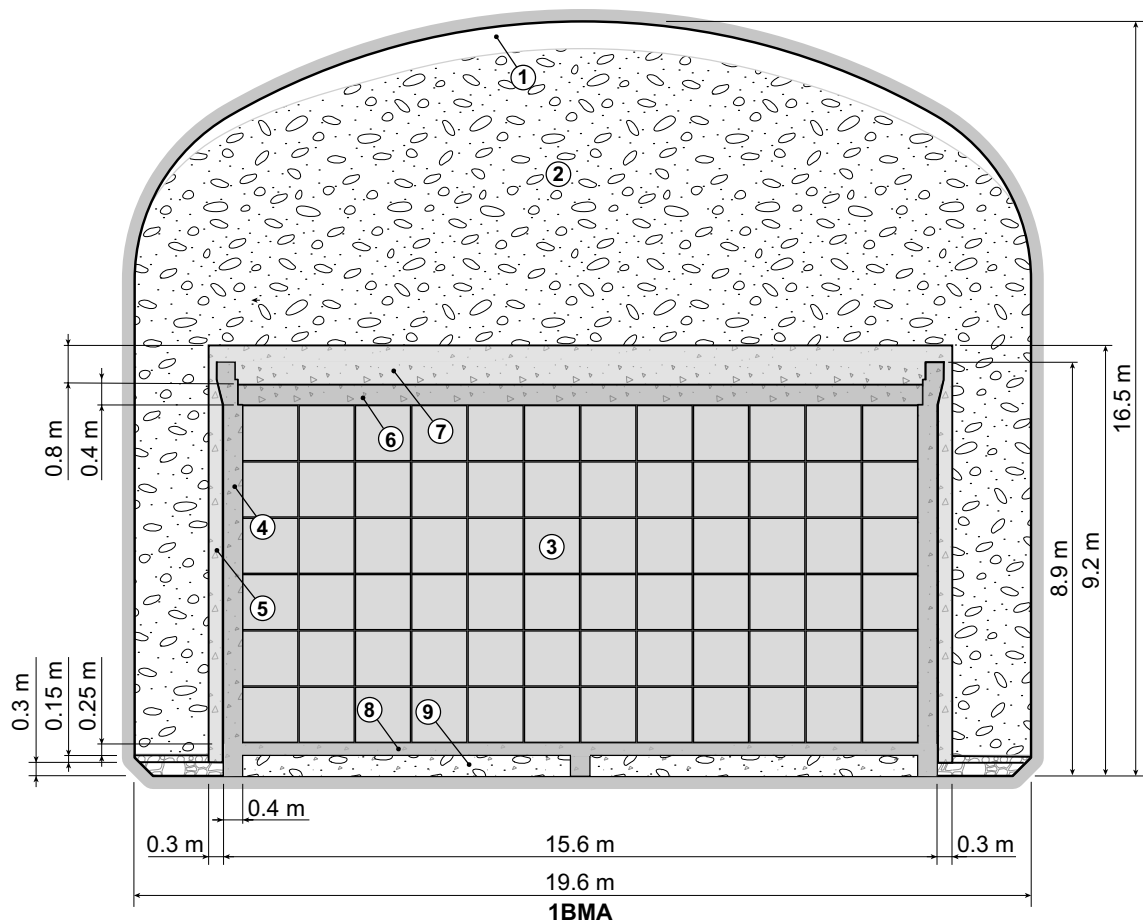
Schematic cross-section of IBMA at closure. Key to numbering: 1) Void 2) Macadam backfill 3) Waste domain 4) Existing outer wall 5) New outer wall 6) Pre-fabricated concrete element 7) New concrete lid 8) Slab 9) Crushed rock.
